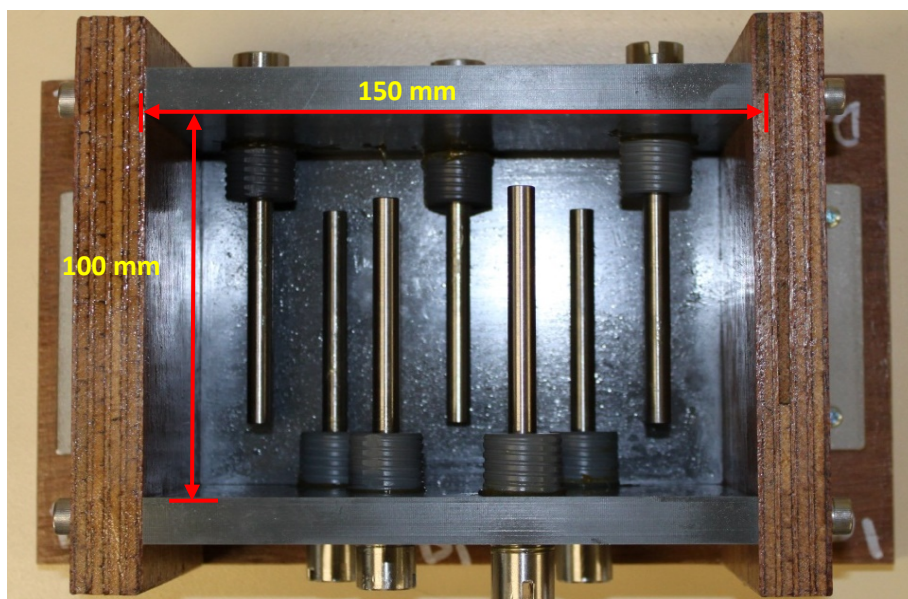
Plan View of mould used for casting concrete specimens for moisture measurement
